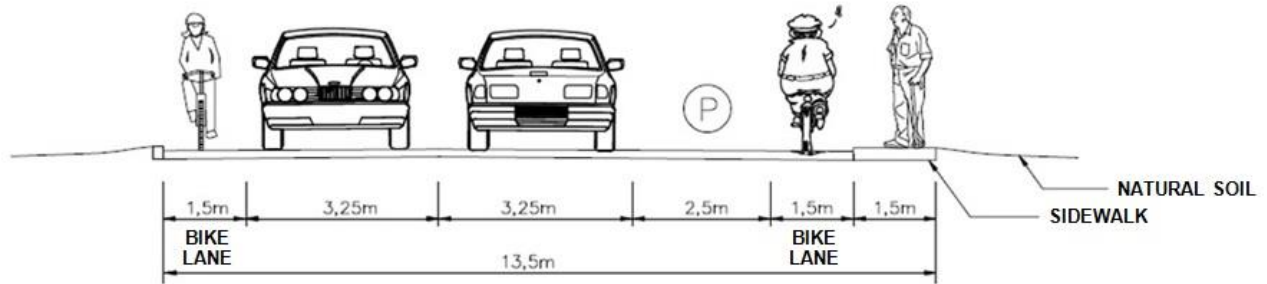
Proposed Cross-section for Old Chelsea Road – East of Scott Road
